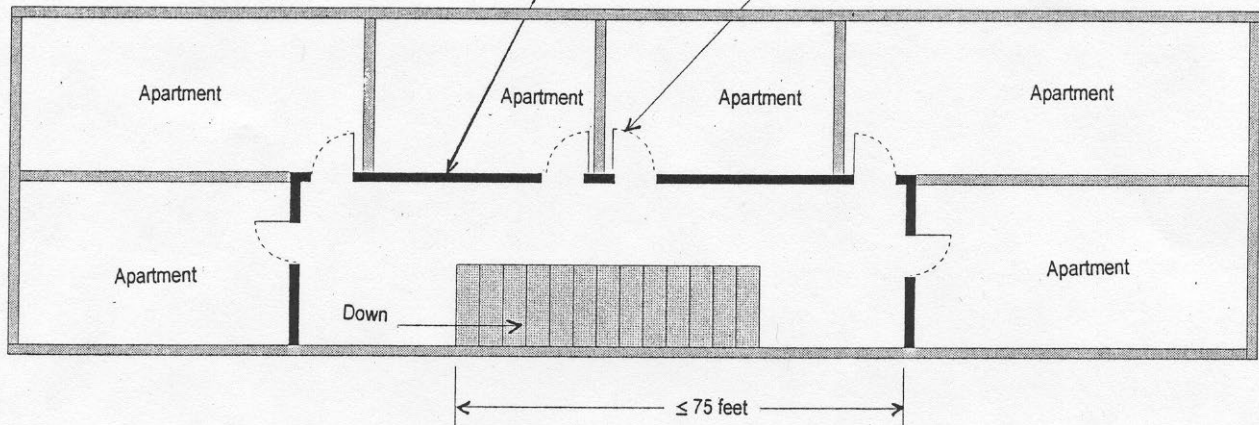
B. Interior exit enclosure for a building with one interior exit and one fire escape or exterior stair.
